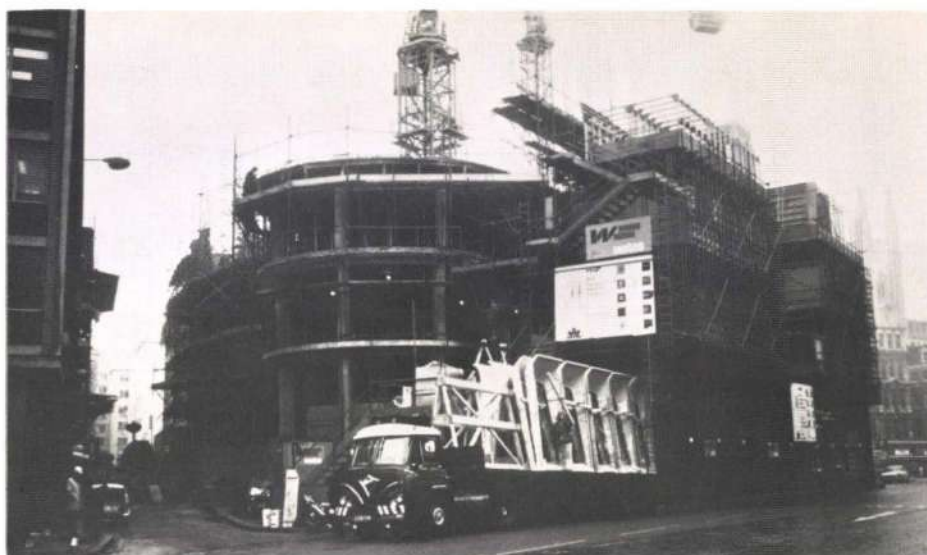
Phase I from south west corner Bread Street/Queen Victoria Street Junction. Structure up to third floor, external GRC units being delivered, Wates Construction Limited gantry on the right (Photo: Tony Dixon)
